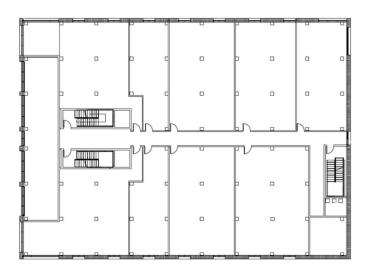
Hypothetical building floor plan (for illustrative purposes only).
